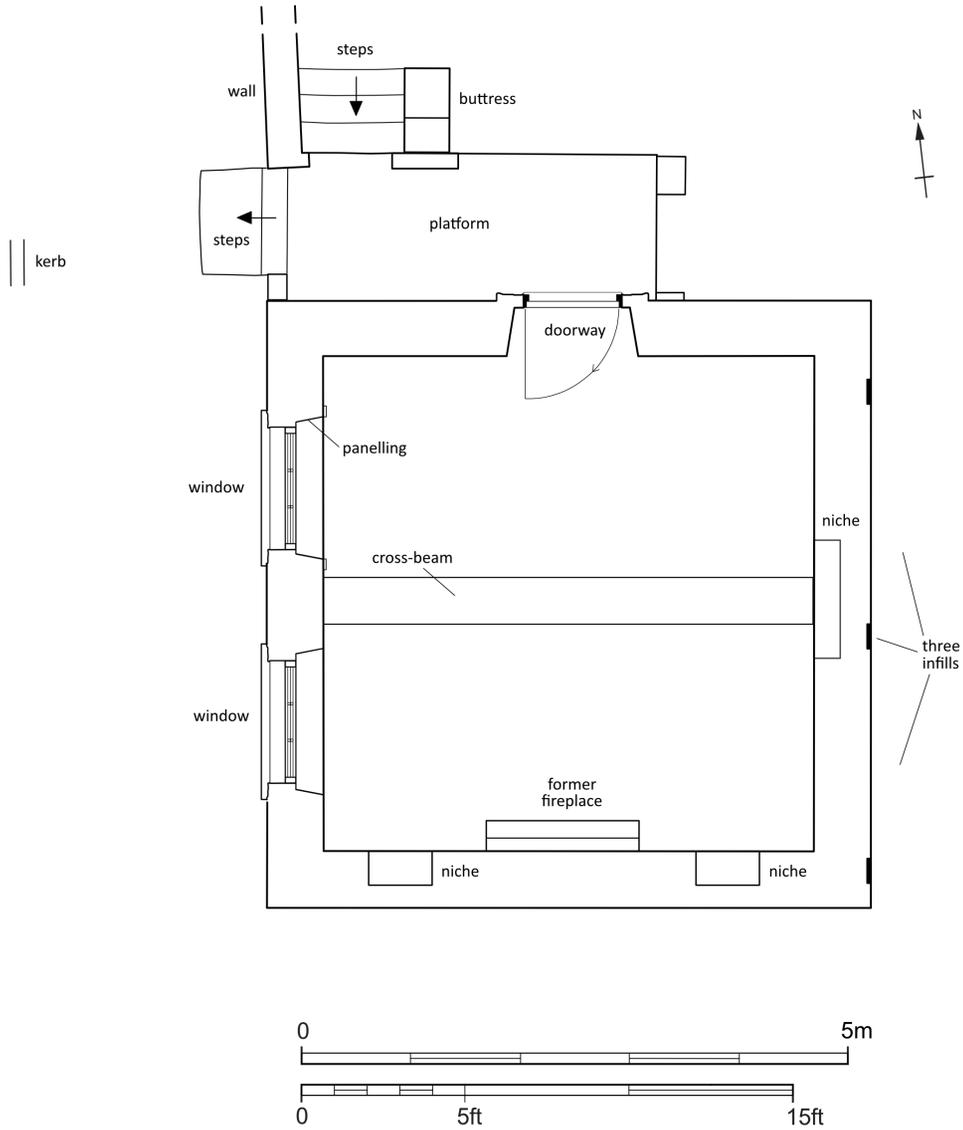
Bridge Cottage, Cromford: Plan of the main floor area. Scale 1:50.
